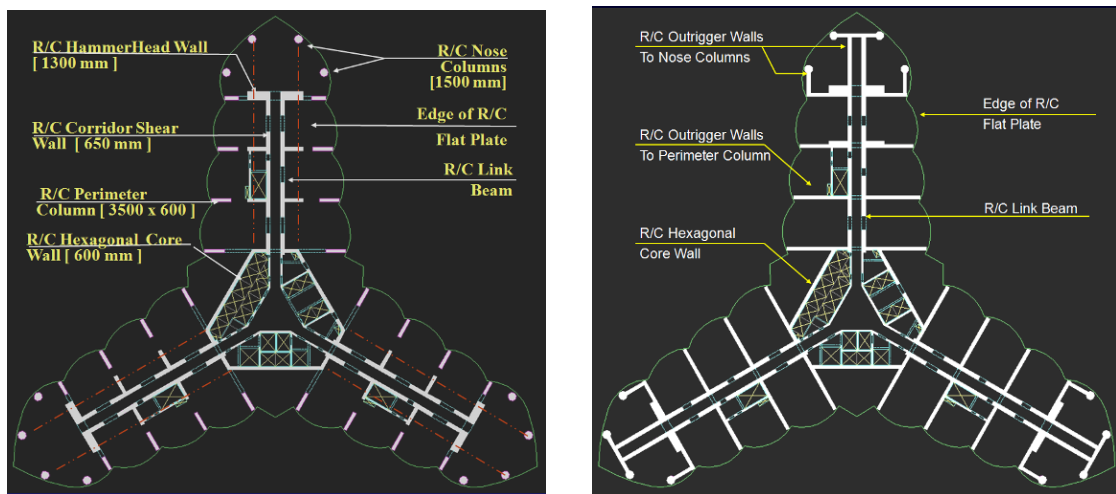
Typical Floor Framing Plans at a) typical hotel level and at b) Typical Mechanical Level
